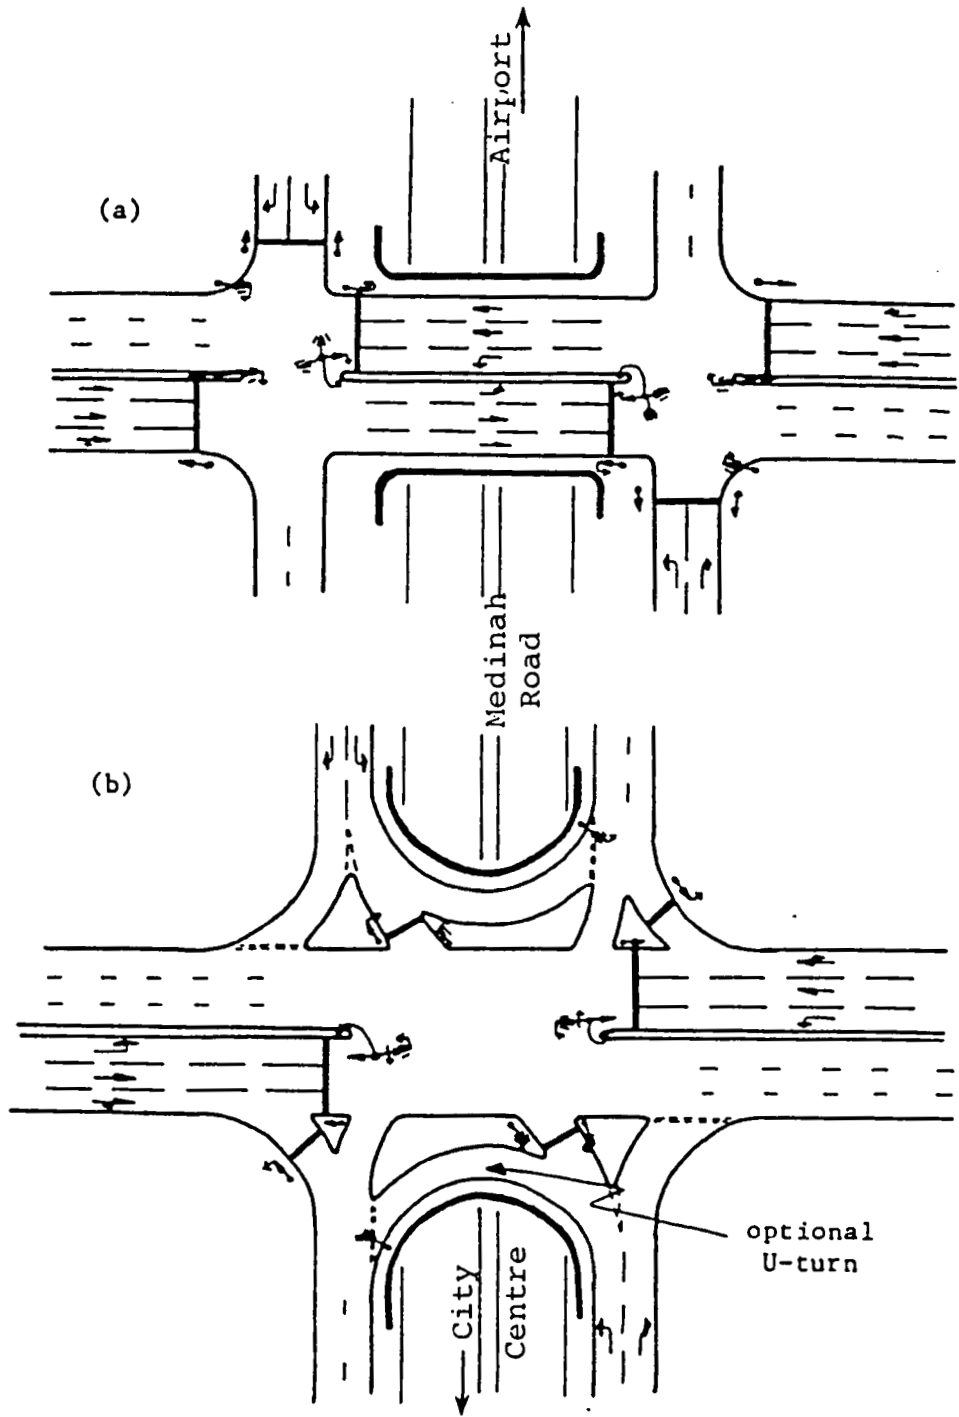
Layouts of Signalized Diamond Intersection (Medinah-Airport Road) Jeddah.
